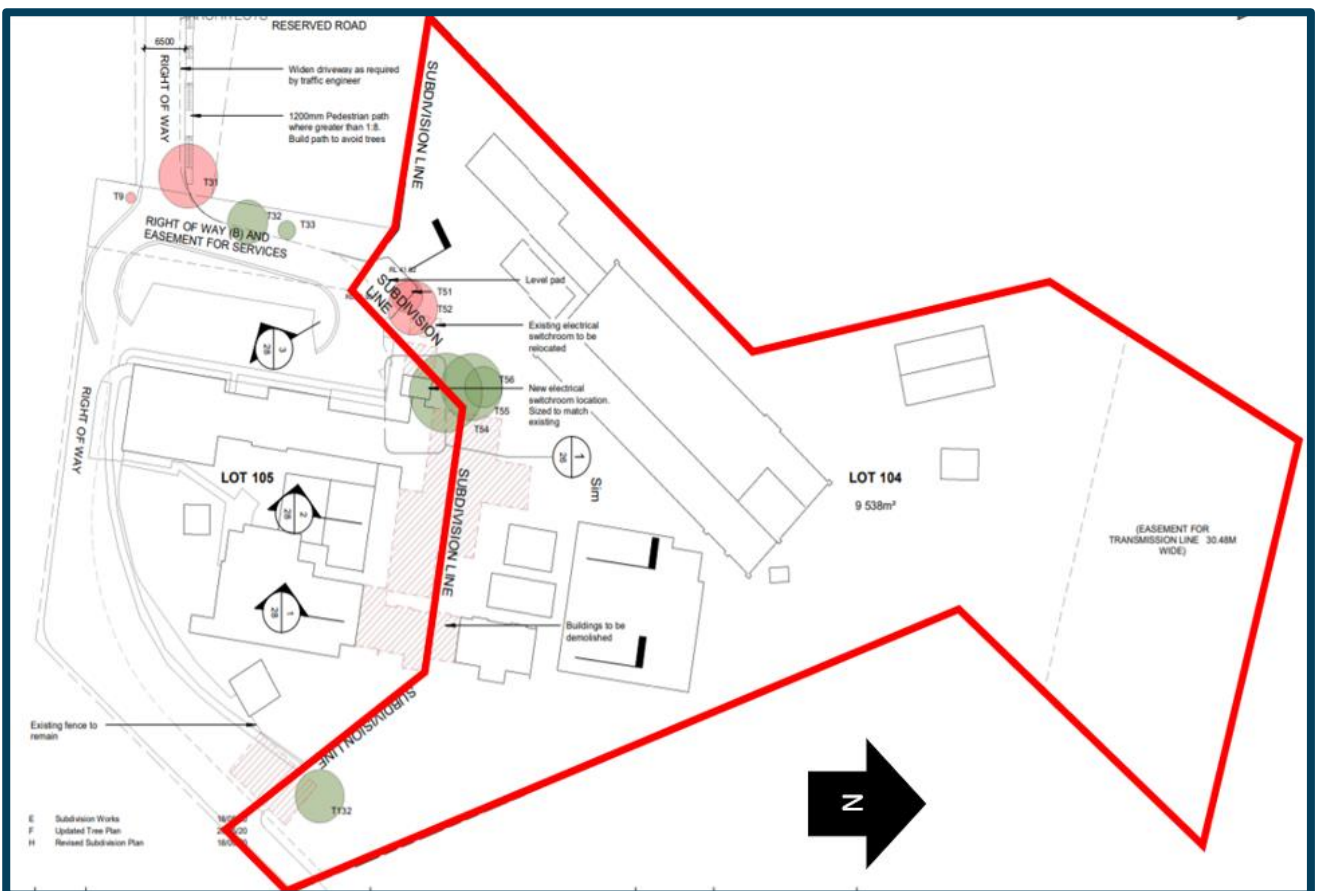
Approved two lot subdivision of DA20/0381 – the planning proposal site is highlighted red (source: DA20/0381)
